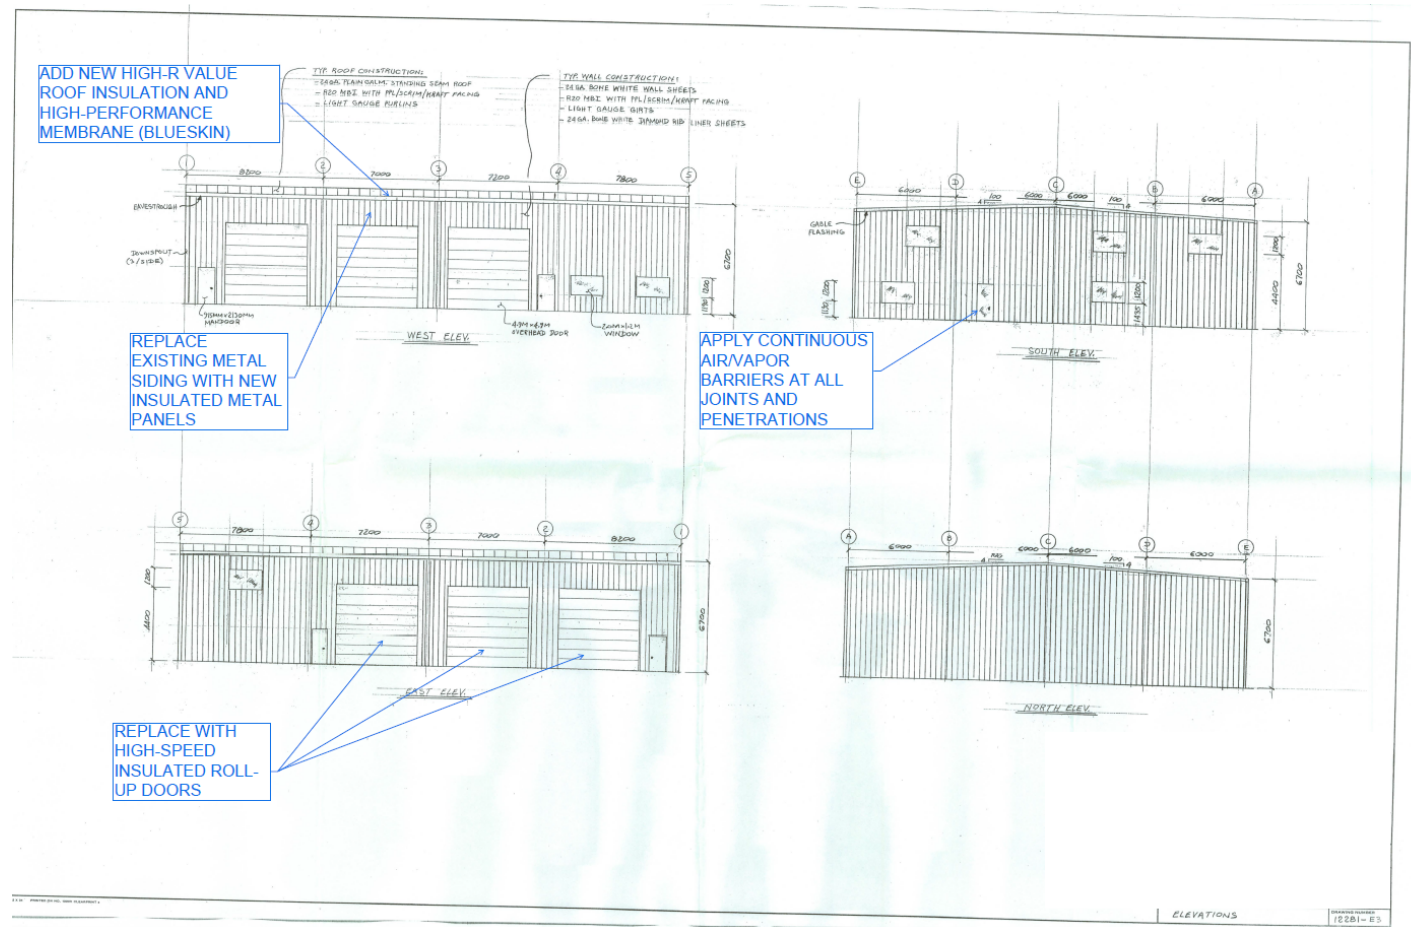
Elevation drawing annotated to highlight proposed wall, roof, air sealing, and truck bay door upgrades.
